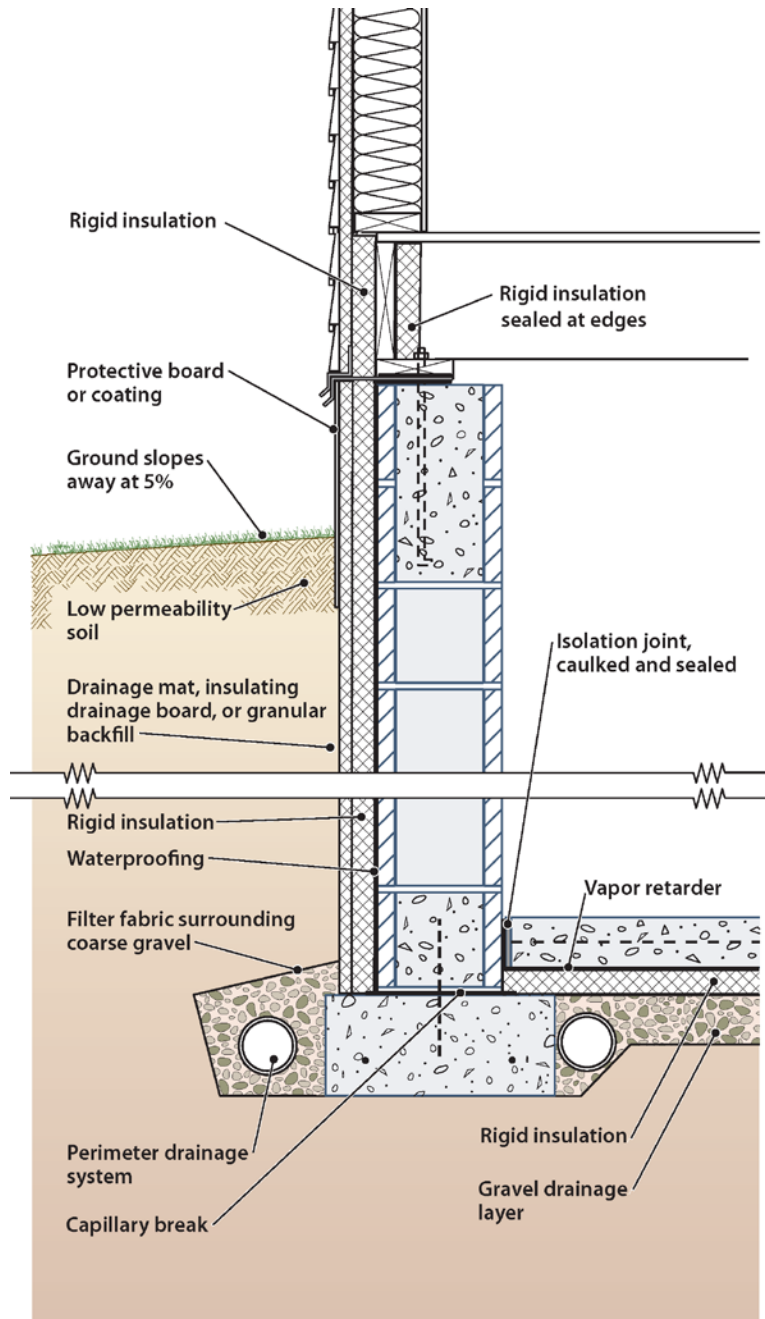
Concrete masonry foundation wall with exterior rigid/semi-rigid insulation
